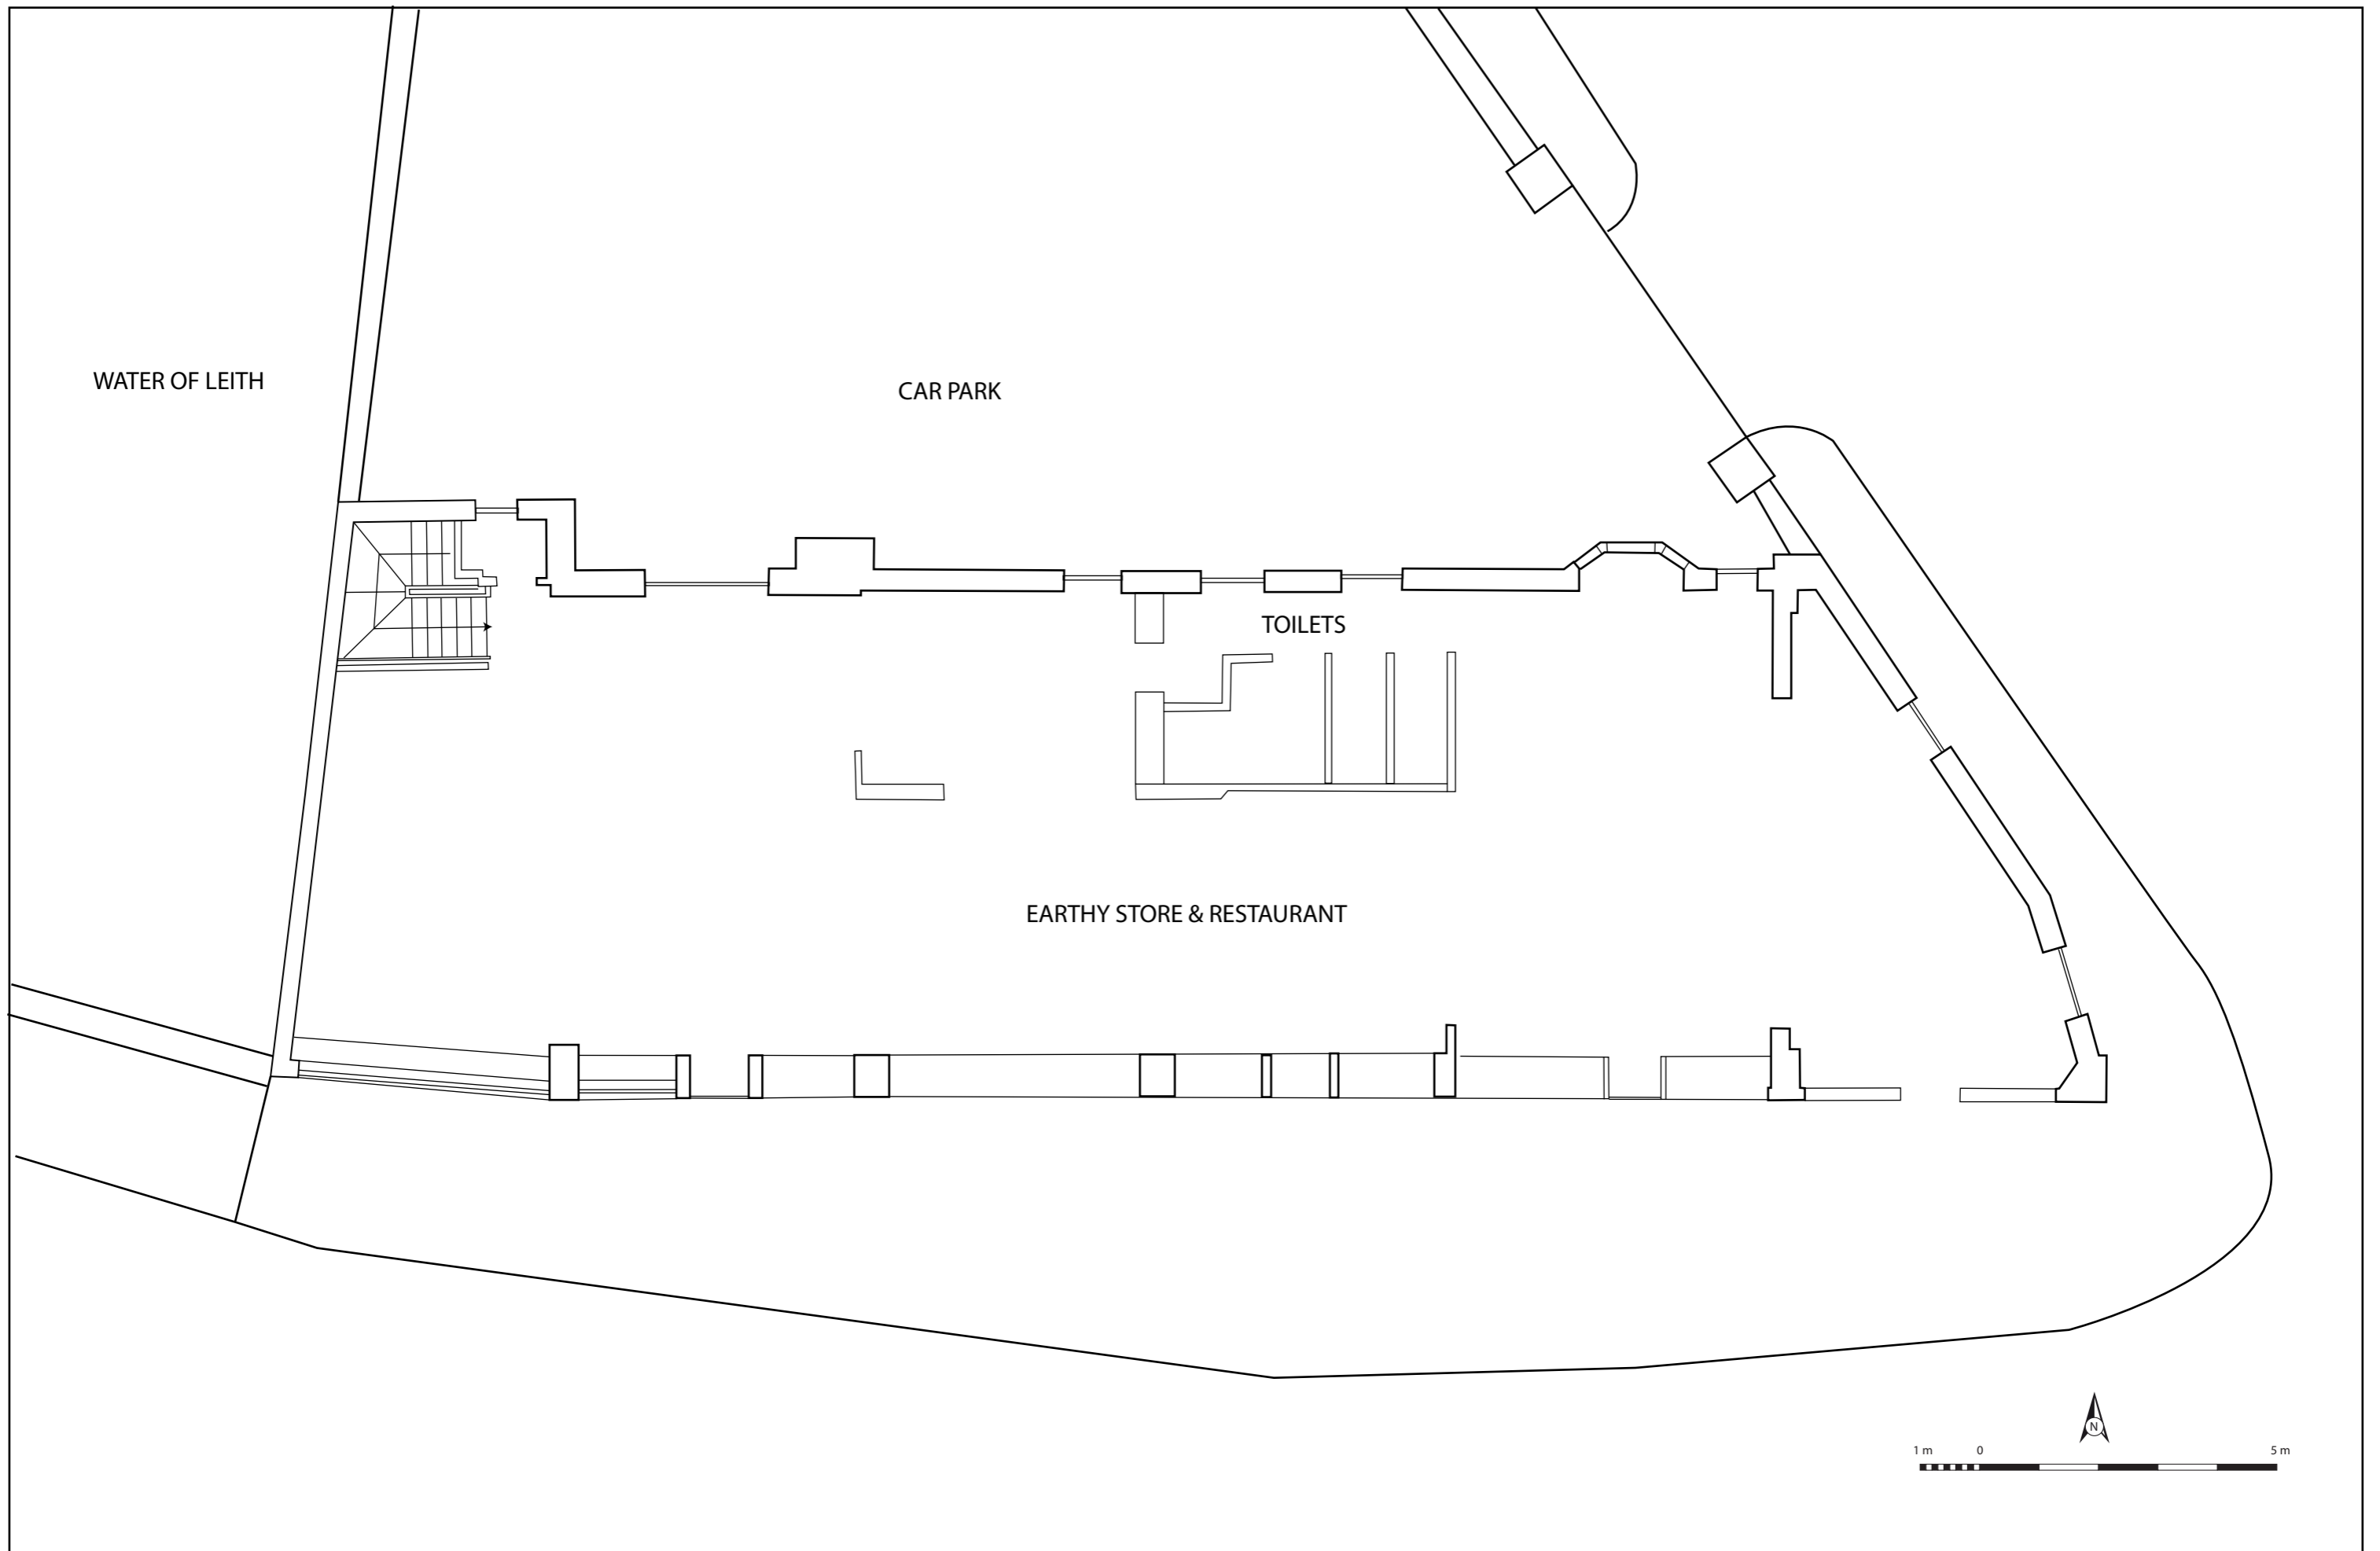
Nos 1 - 6 Canonmills Bridge, ground floor plan
